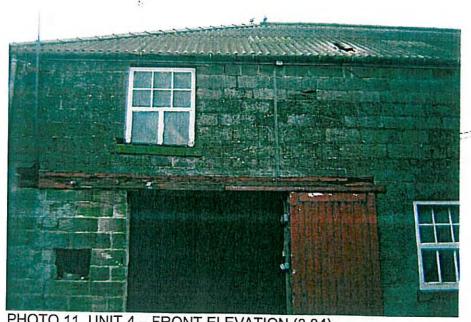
UNIT 4 - FRONT ELEVATION (3.04)
